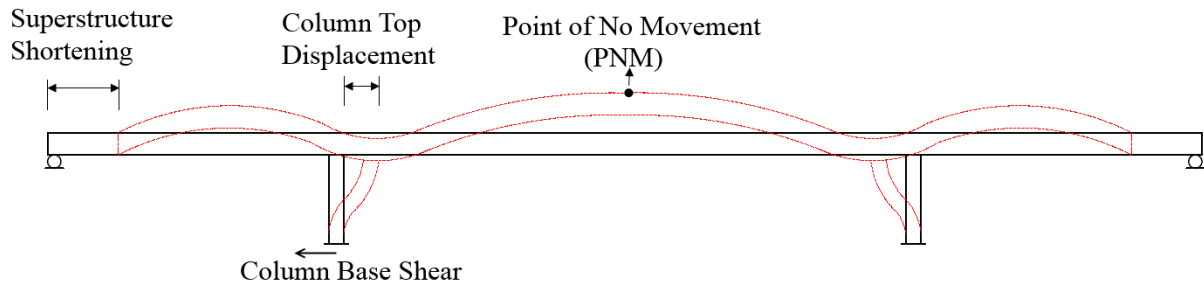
Continuous prestressed concrete bridge frame deformations due to axial force, creep and shrinkage
